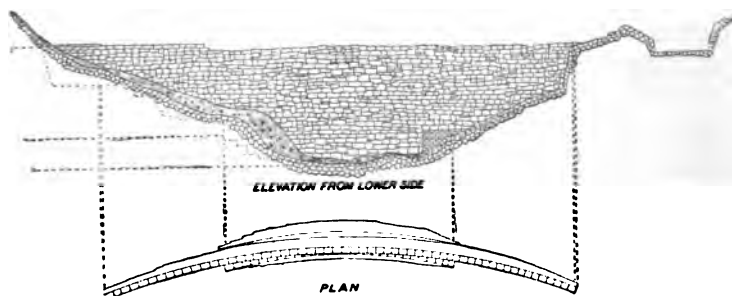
Plan and Elevation of Bear Valley Dam, California.
